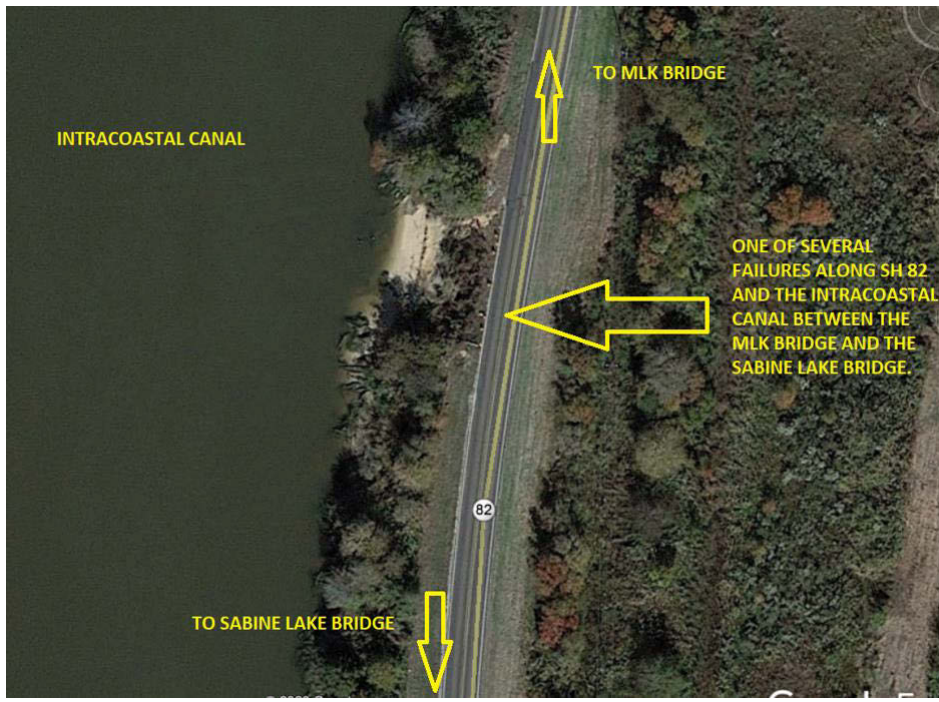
Pavement Failure due to Hurricane Harvey
